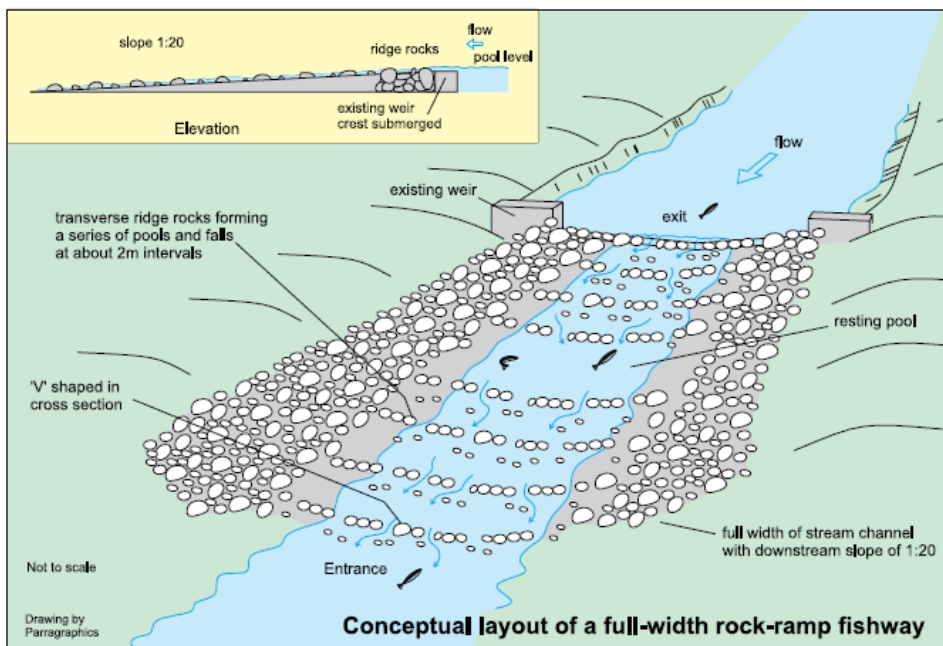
Conceptual layout of full width rock ramp fishway (Thorncraft and Harris 2000).
